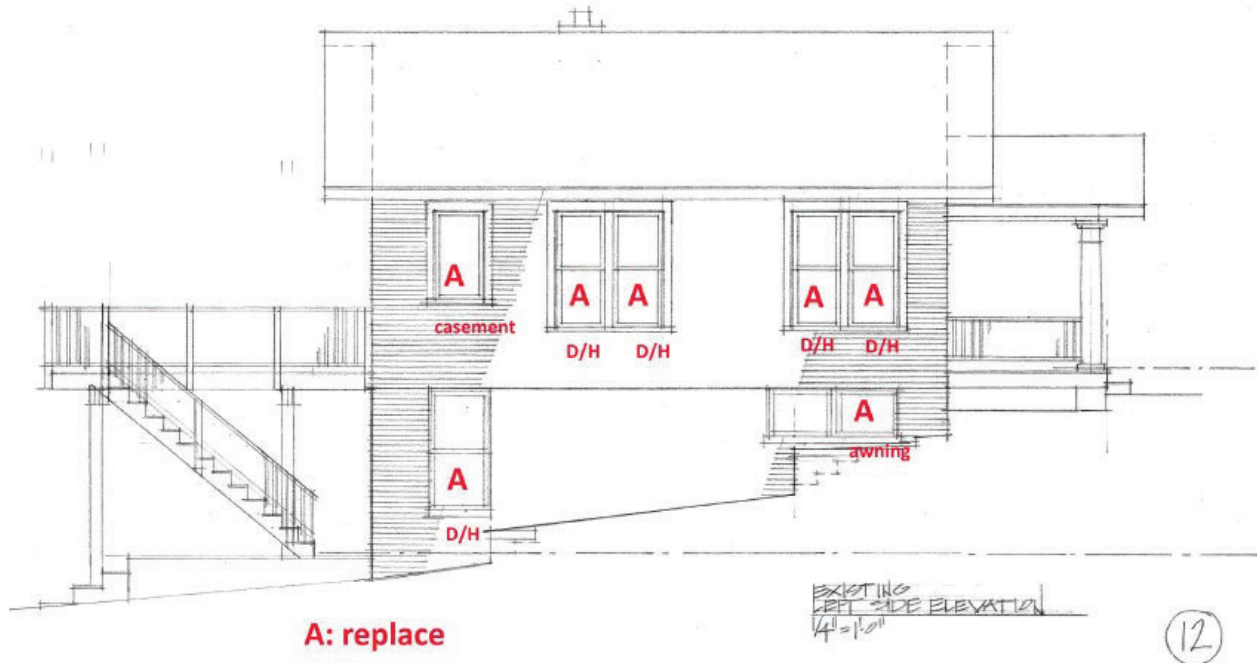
Left (south) side elevation showing the proposed window replacement. The applicants propose to replace all existing vinyl windows with new aluminum-clad windows to match the existing window types, except for one existing double-hung which is proposed to be replaced with a casement as noted.
